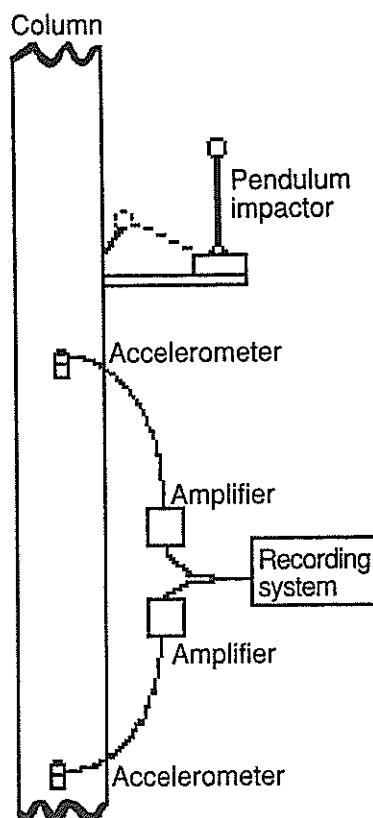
Instrumentation utilized to test wood members in water cooling tower.
